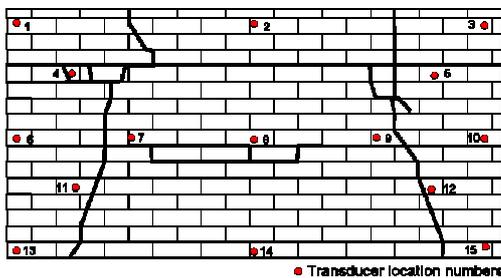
(a). Crack pattern and deflection at centre for hollow block wall (6m x 3m) supported on all 4 sides
